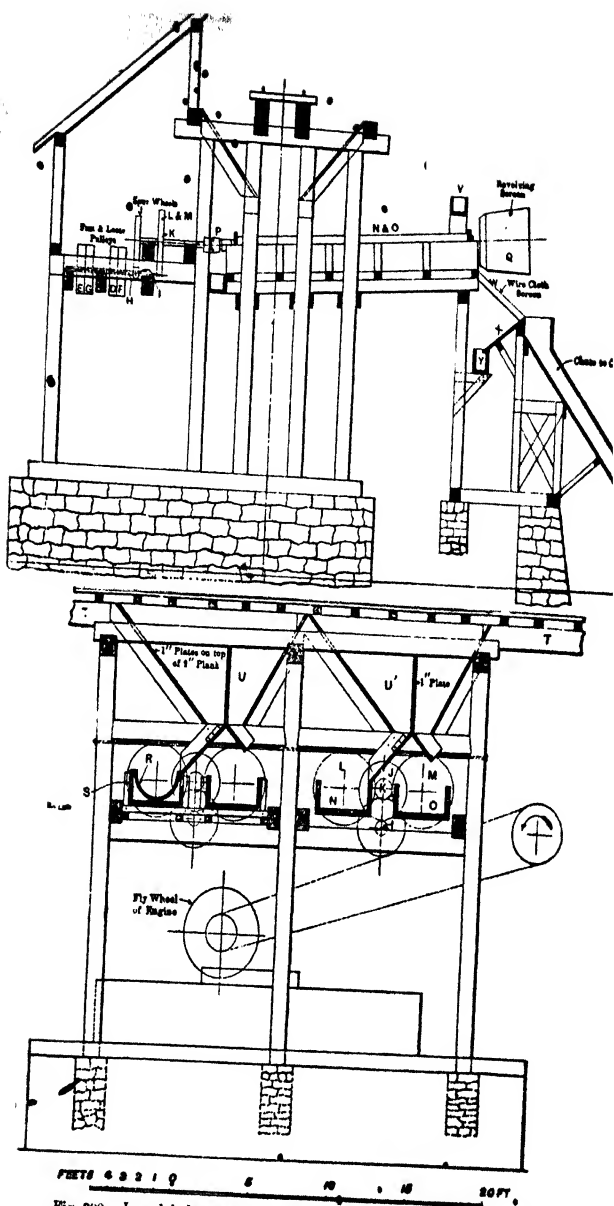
Longdale log washer. Longitudinal and transverse elevations.
